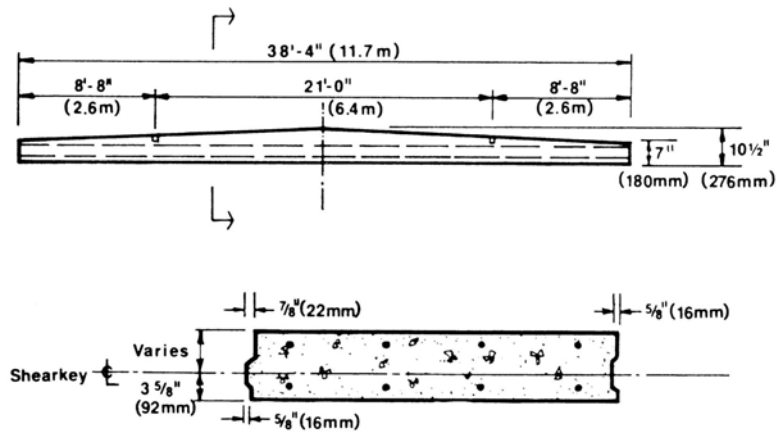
Panel elevation and shear key details, Knightstown Bridge (Ref 9)
